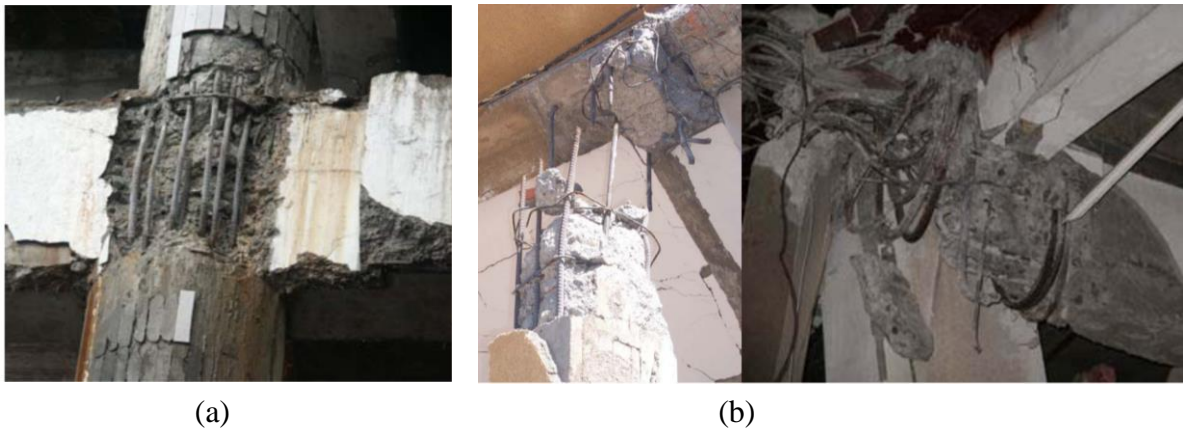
(a) Joint Shear Failure and (b) Anchorage Failure[3]
